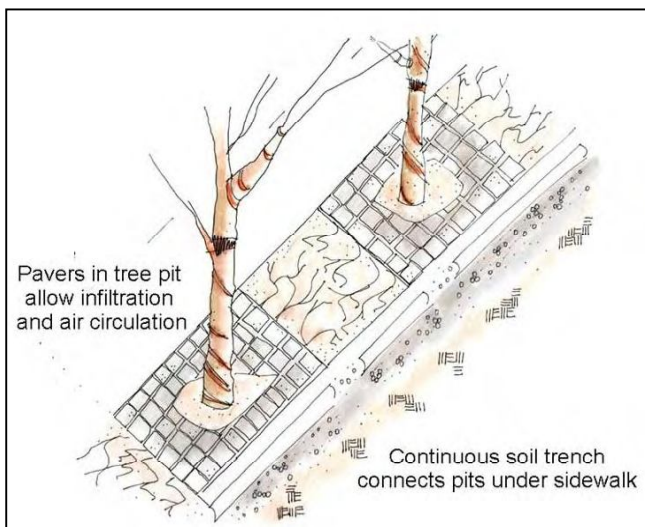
Plan and profile detail on stormwater tree pit design with shared rooting space.
